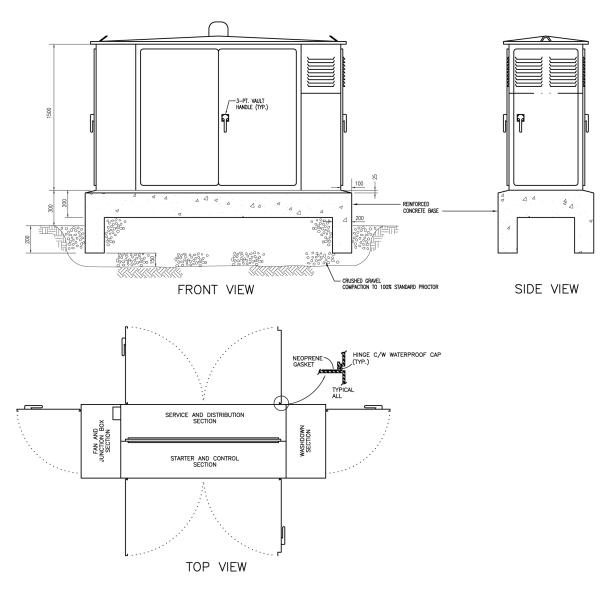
Typical Pump Station Electrical Kiosk Layout
